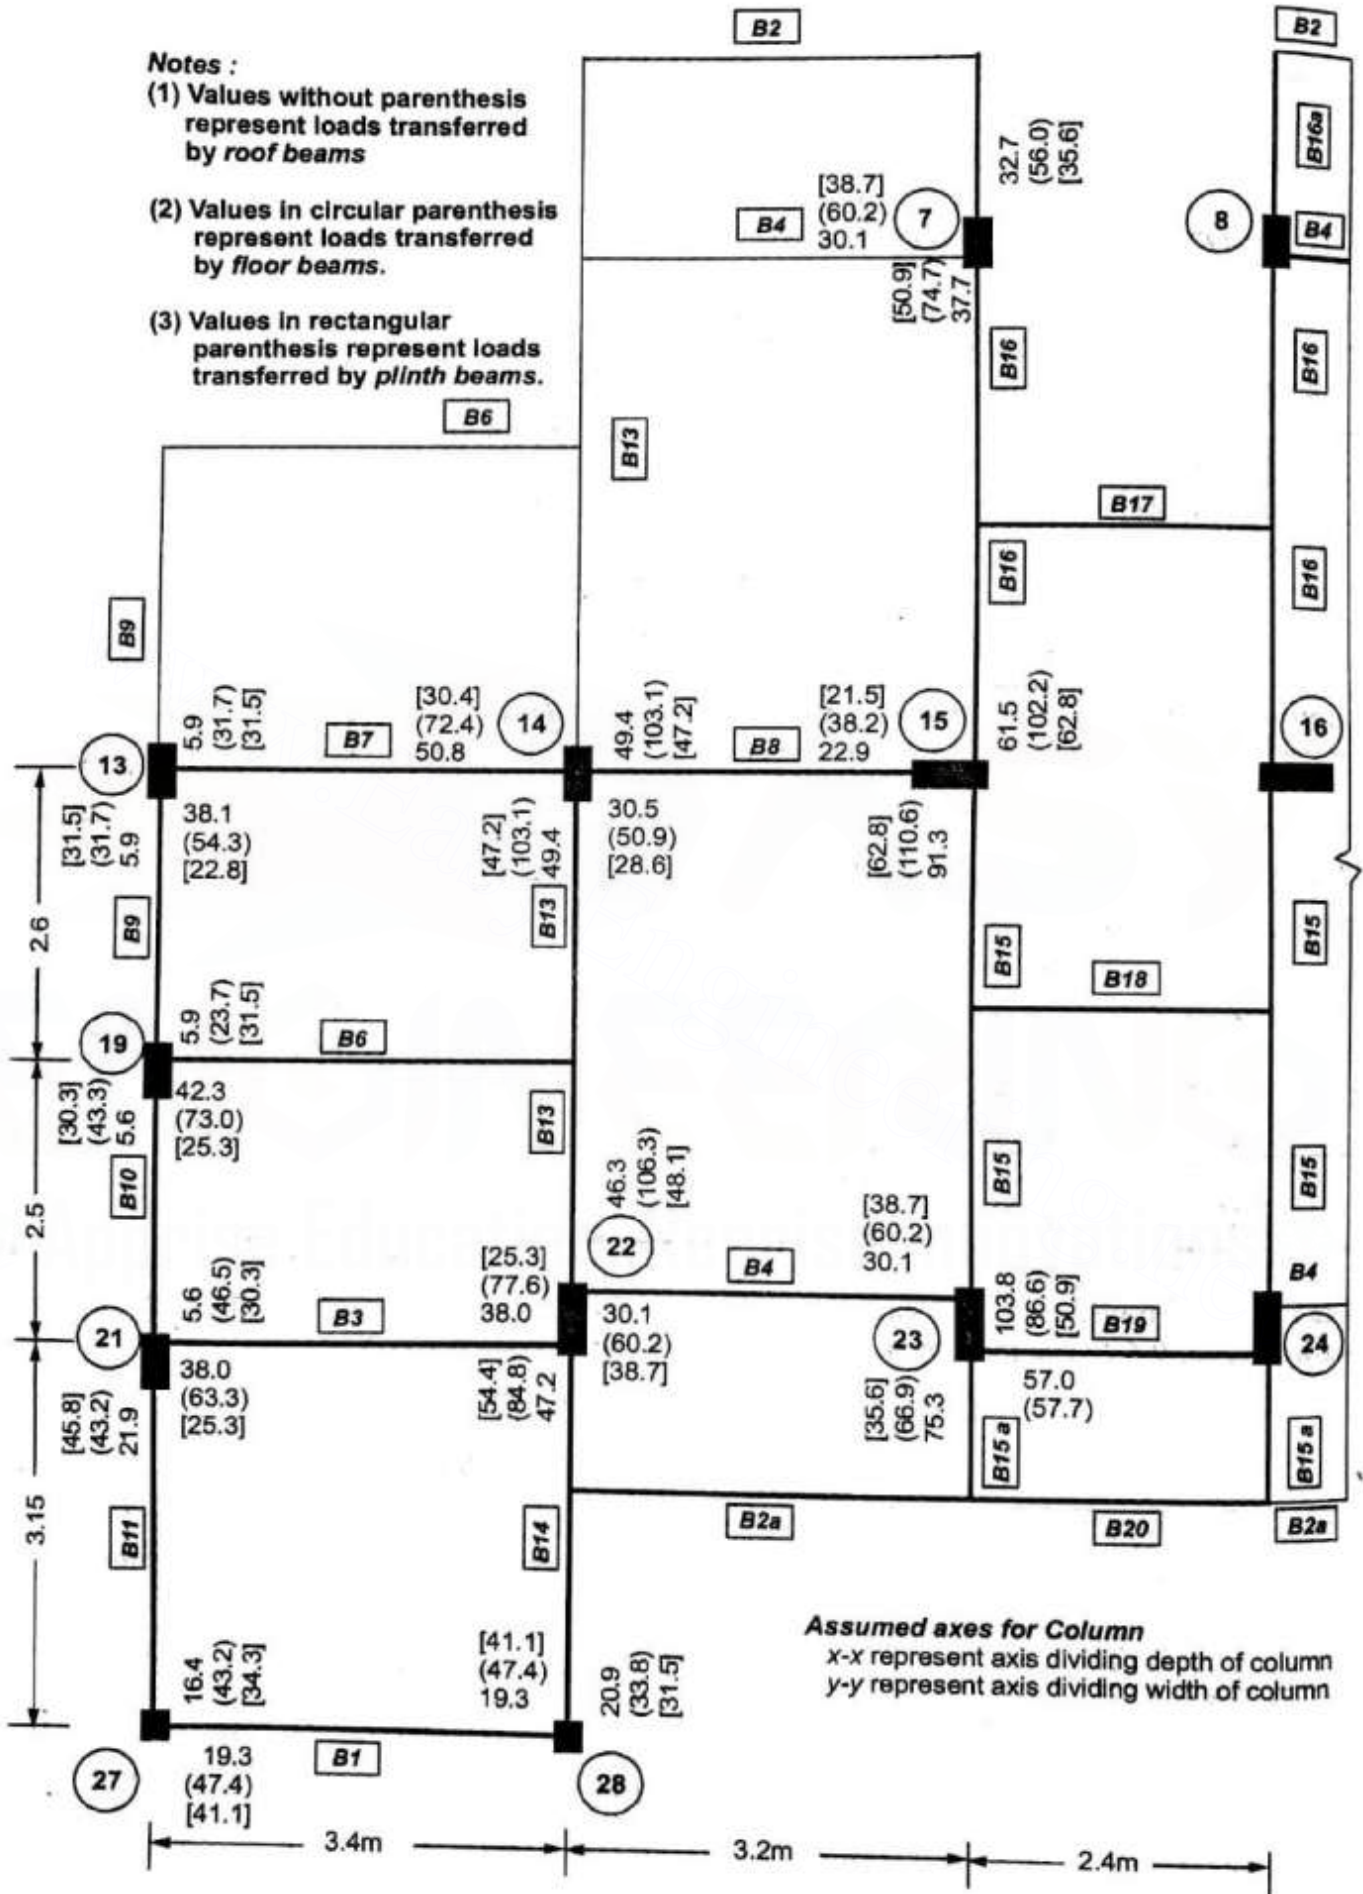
Plan showing Beam end Shear transferred to columns
